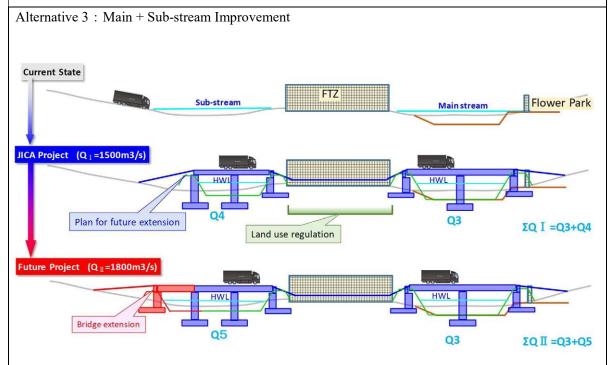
Palmeraie Road Phased Improvement Plan (draft)
